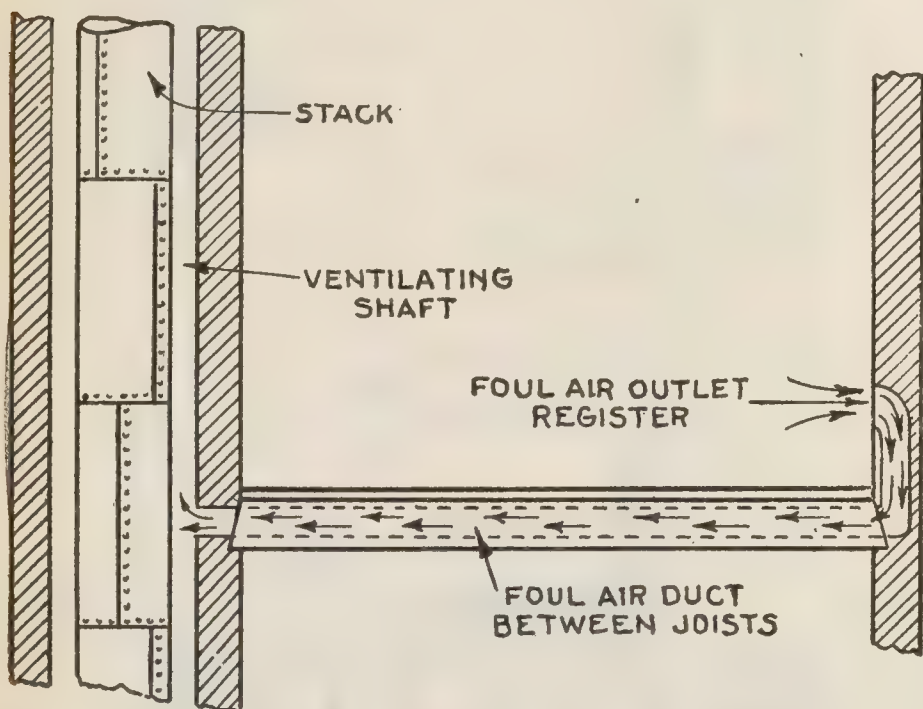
,564.—Method of connecting foul air duct between joists to ventilating shaft.
